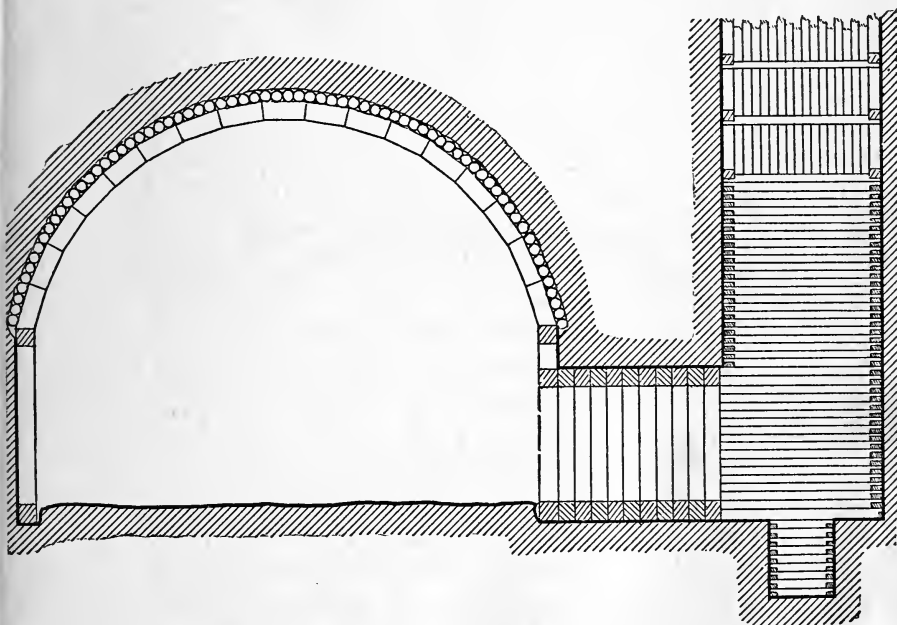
CONNECTION WITH SHAFT, CHURCH HILL TUNNEL.
